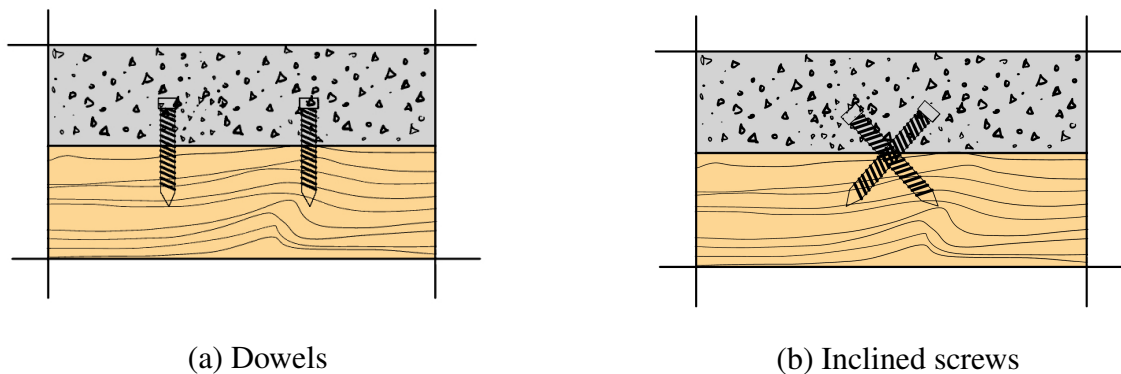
Dowel connections (a) and connection with inclined screws (b) (remade by author, adapted from Johari et al. (2023))
